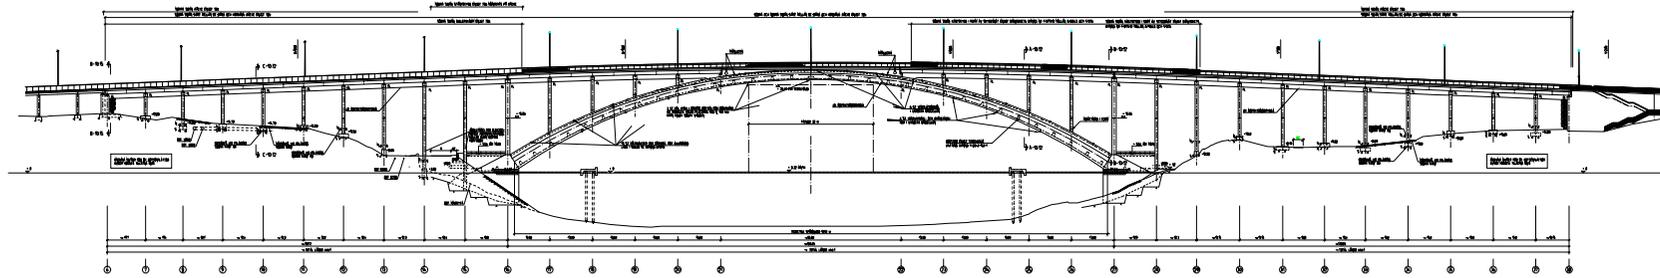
Longitudinal elevation of Traneberg Bridge
